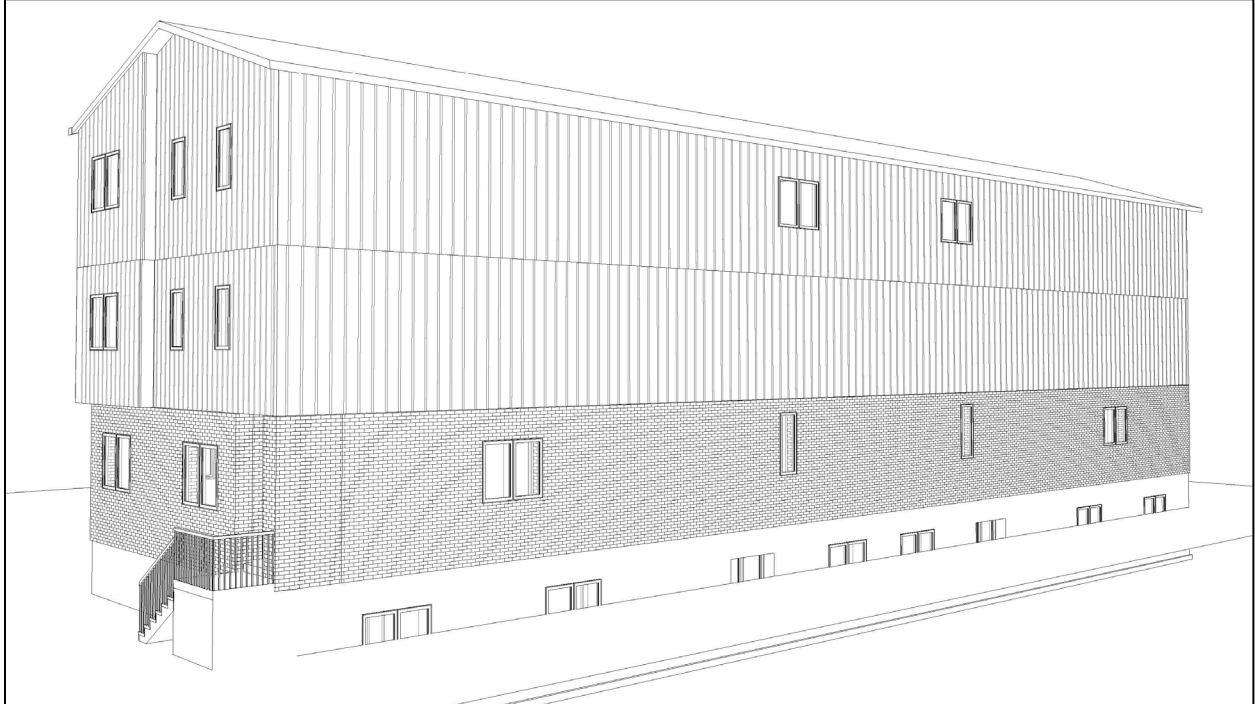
Proposed stacked townhouse elevations (looking west/north)
